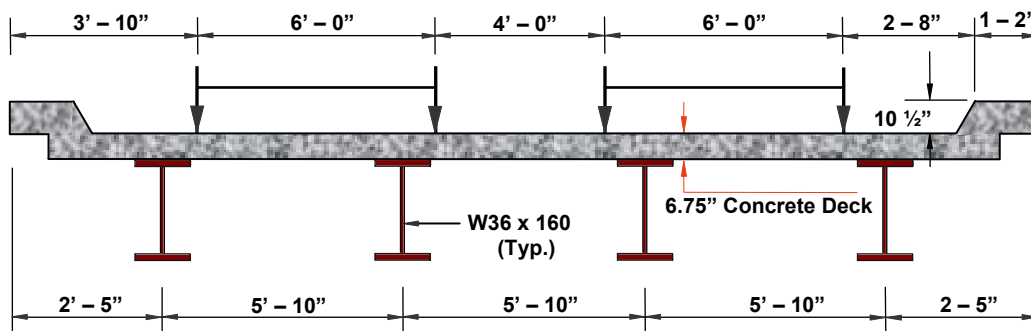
Stalling bridges cross-section and horizontal truck loading positions
